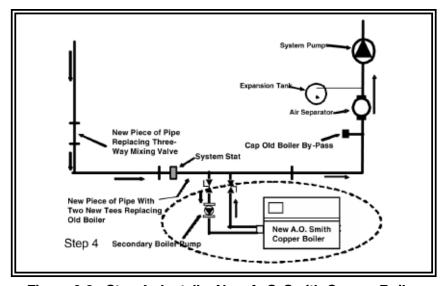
Step 4 - Install a New A. O. Smith Copper Boiler
